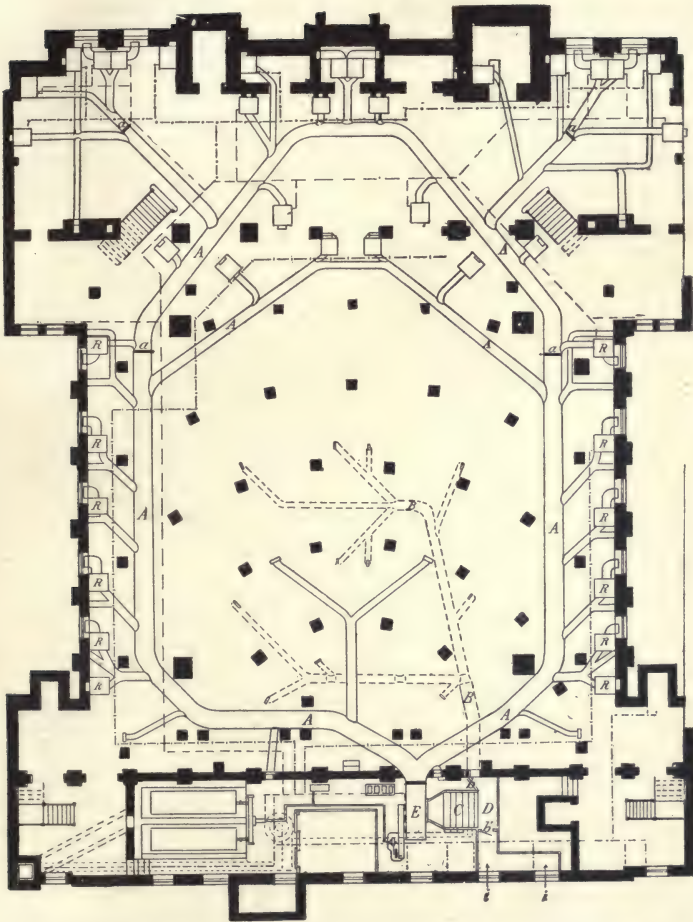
HEBREW TEMPLE, KENESETH-ISRAEL, BROAD STREET, ABOVE COLUMBIA AVENUE, PHILADELPHIA, PA.
